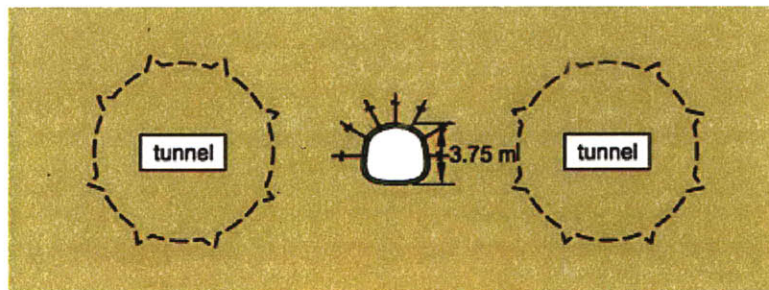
Exploratory adit located outside the final tunnel cross section
